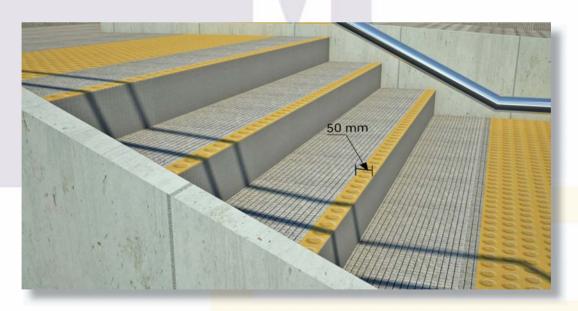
Colour Contrast for Step Edges Guard Rail under Soffit
